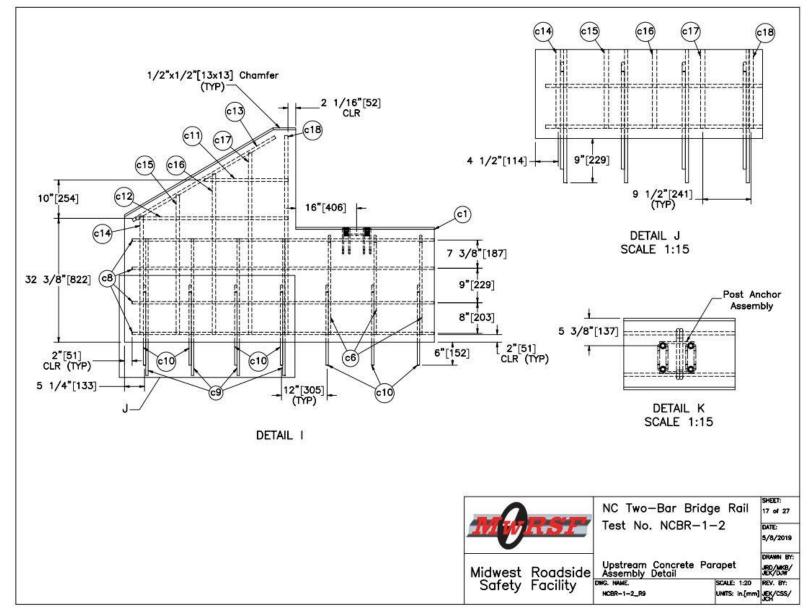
Upstream Concrete Parapet Assembly Detail, Test Nos. NCBR-1 and NCBR-2
